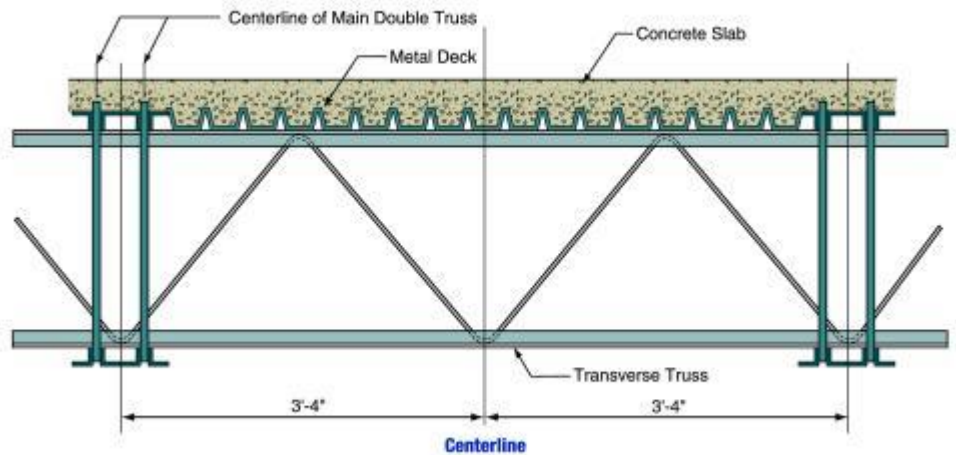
Cross-section through main double trusses, showing transverse truss.
